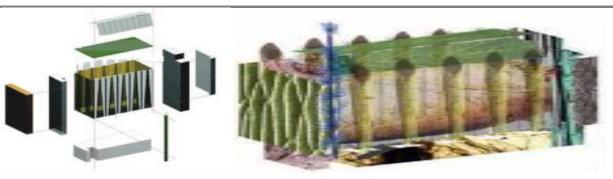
Wind Pipes in the Northern Façade (B) Overlapping Façade Layers, (Radwan and Osama 2016)
